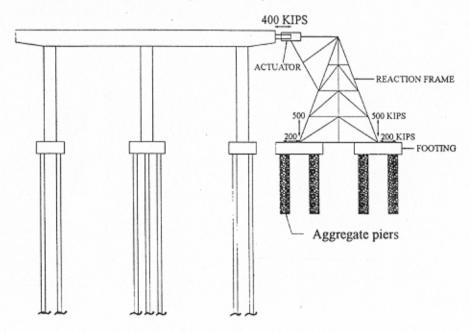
Schematic of instrumented footing testing frame (after Lawton 1999)
